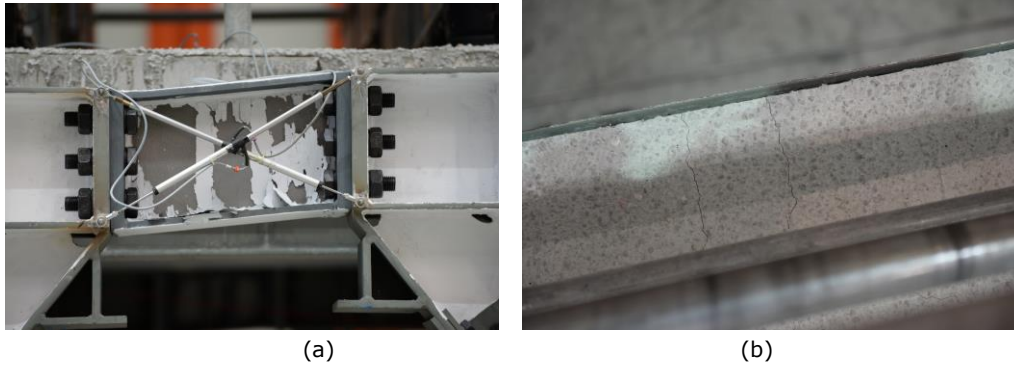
Link behaviour a) and concrete slab state b) at end of PO1 test
